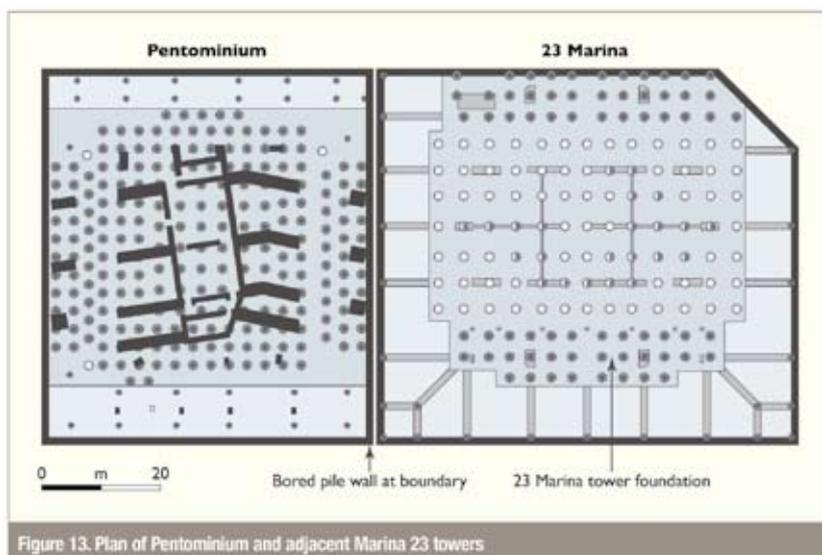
Plan of Pentominium and adjacent Marina 23 towers
